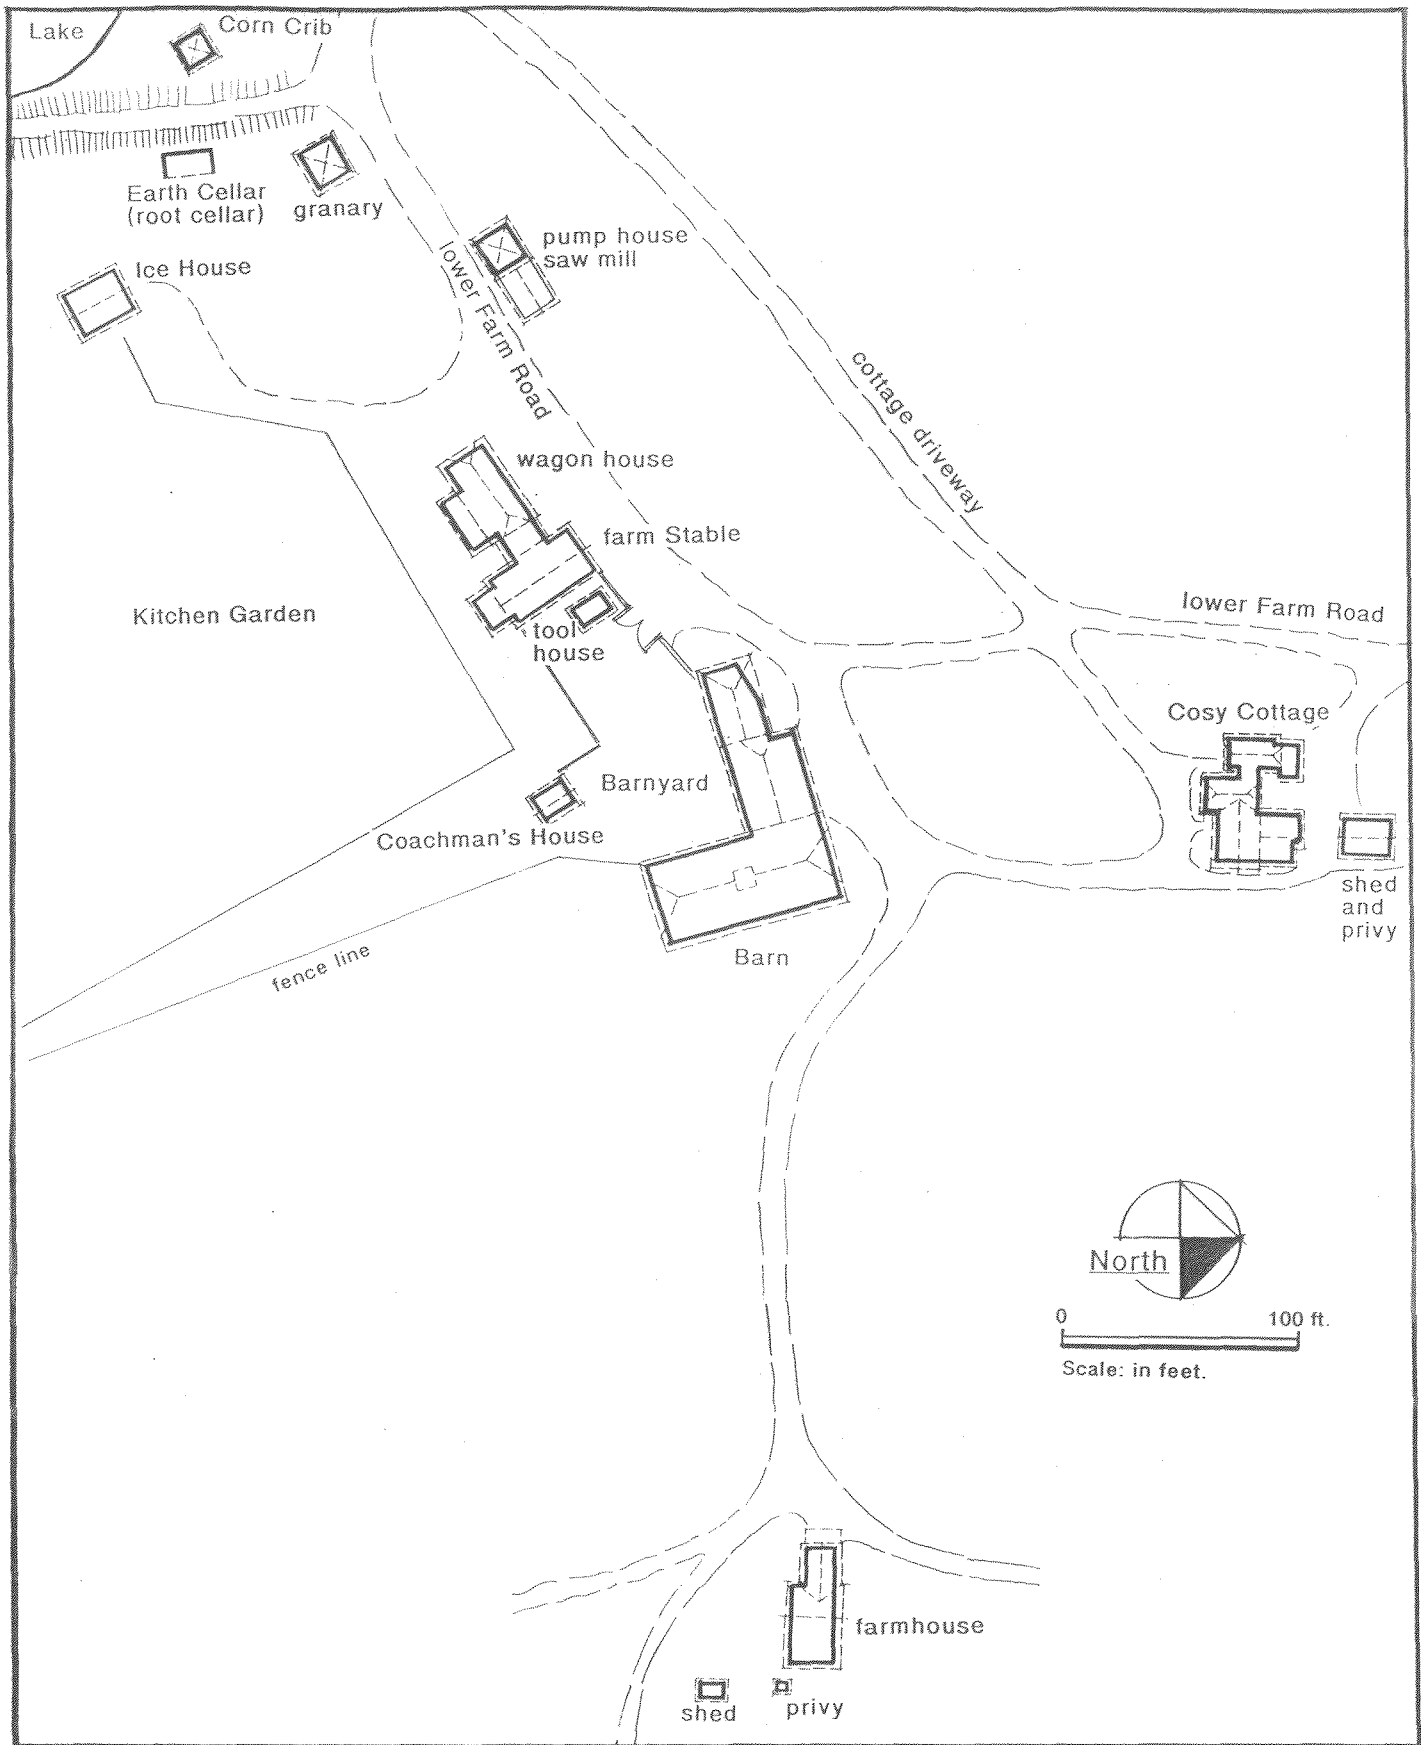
Reconstruction Plan (1891-1900) - Detail showing farm buildings near Cosy Cottage, 1996.
